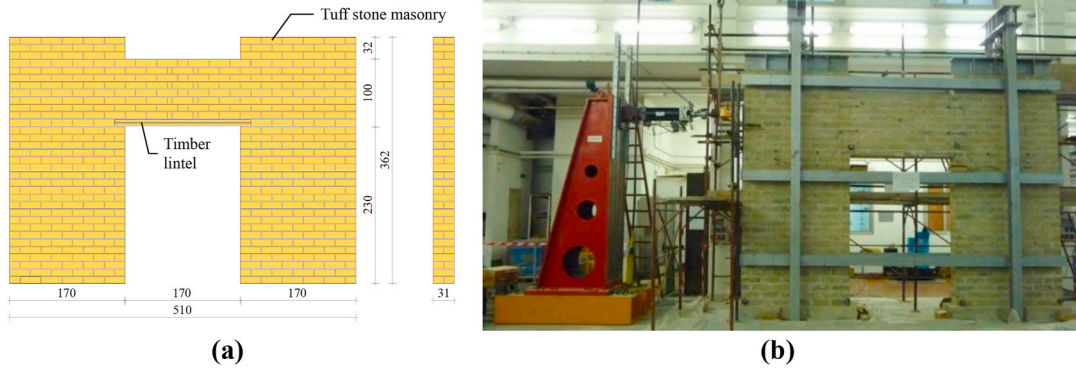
Experimental setup: (a) Geometry of specimen (dimensions in cm); (b) Picture of the instrumented specimen before testing.
